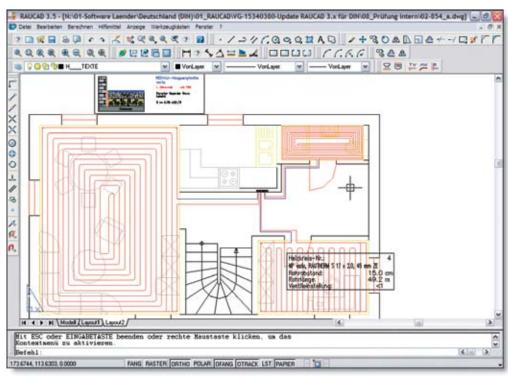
Example for project planning of a REHAU underfloor heating system with the REHAU RAUCAD planning software.
